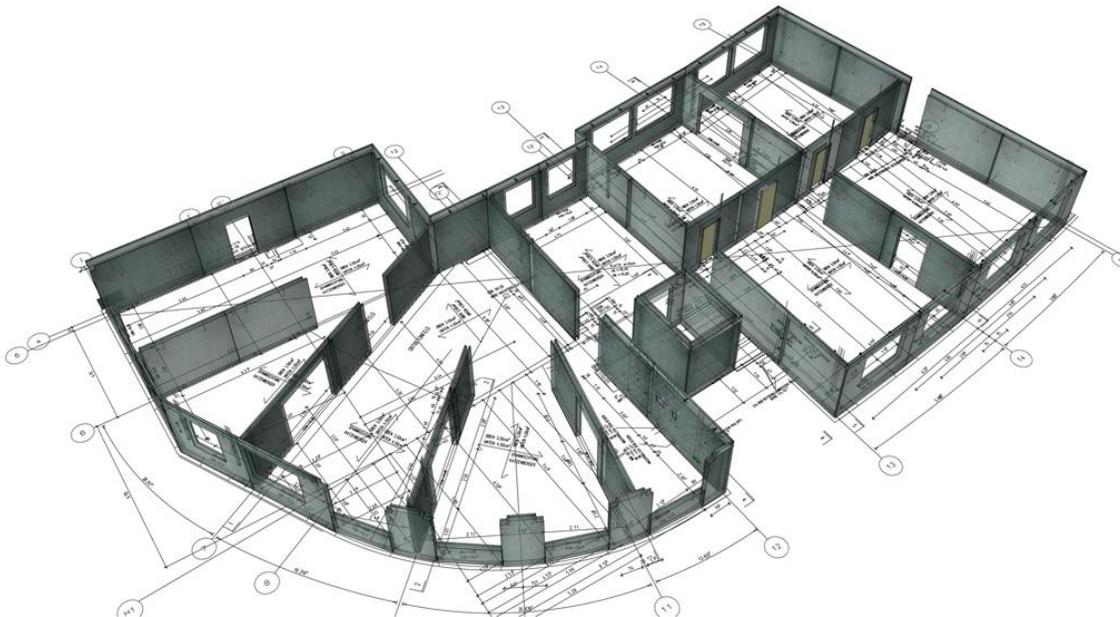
Nemetschek Allplan Precast Elements (Image courtesy of CCIT)
